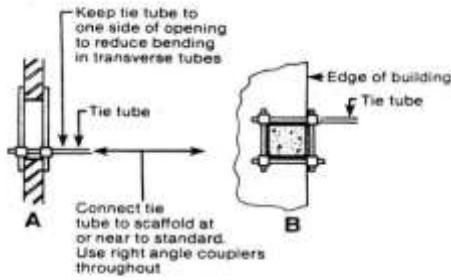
Box tie. A. Vertical or horizontal section through wall. B. Horizontal or vertical section through structural member.
